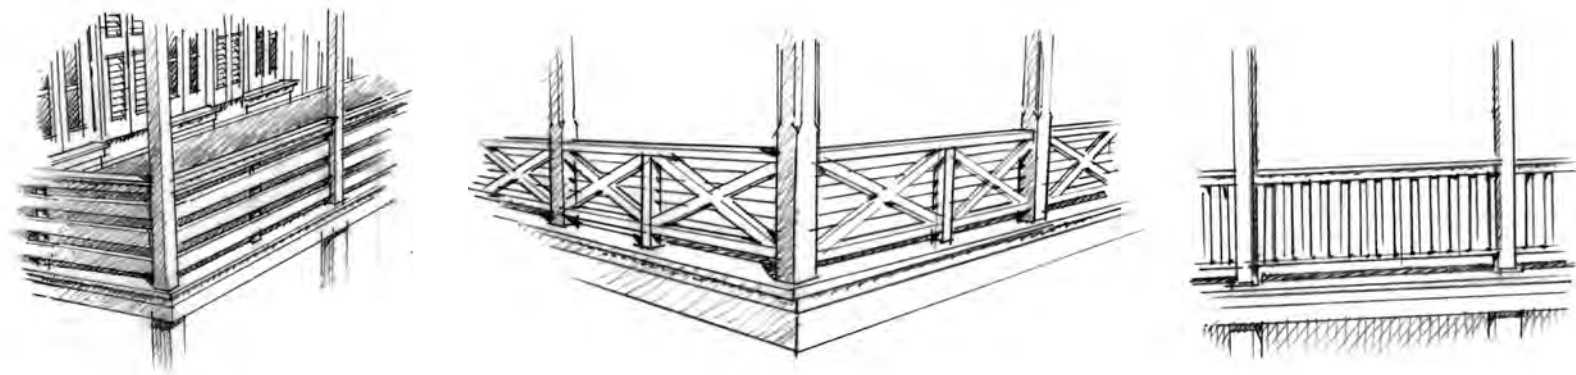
COLUMN AND RAILING DESIGN
